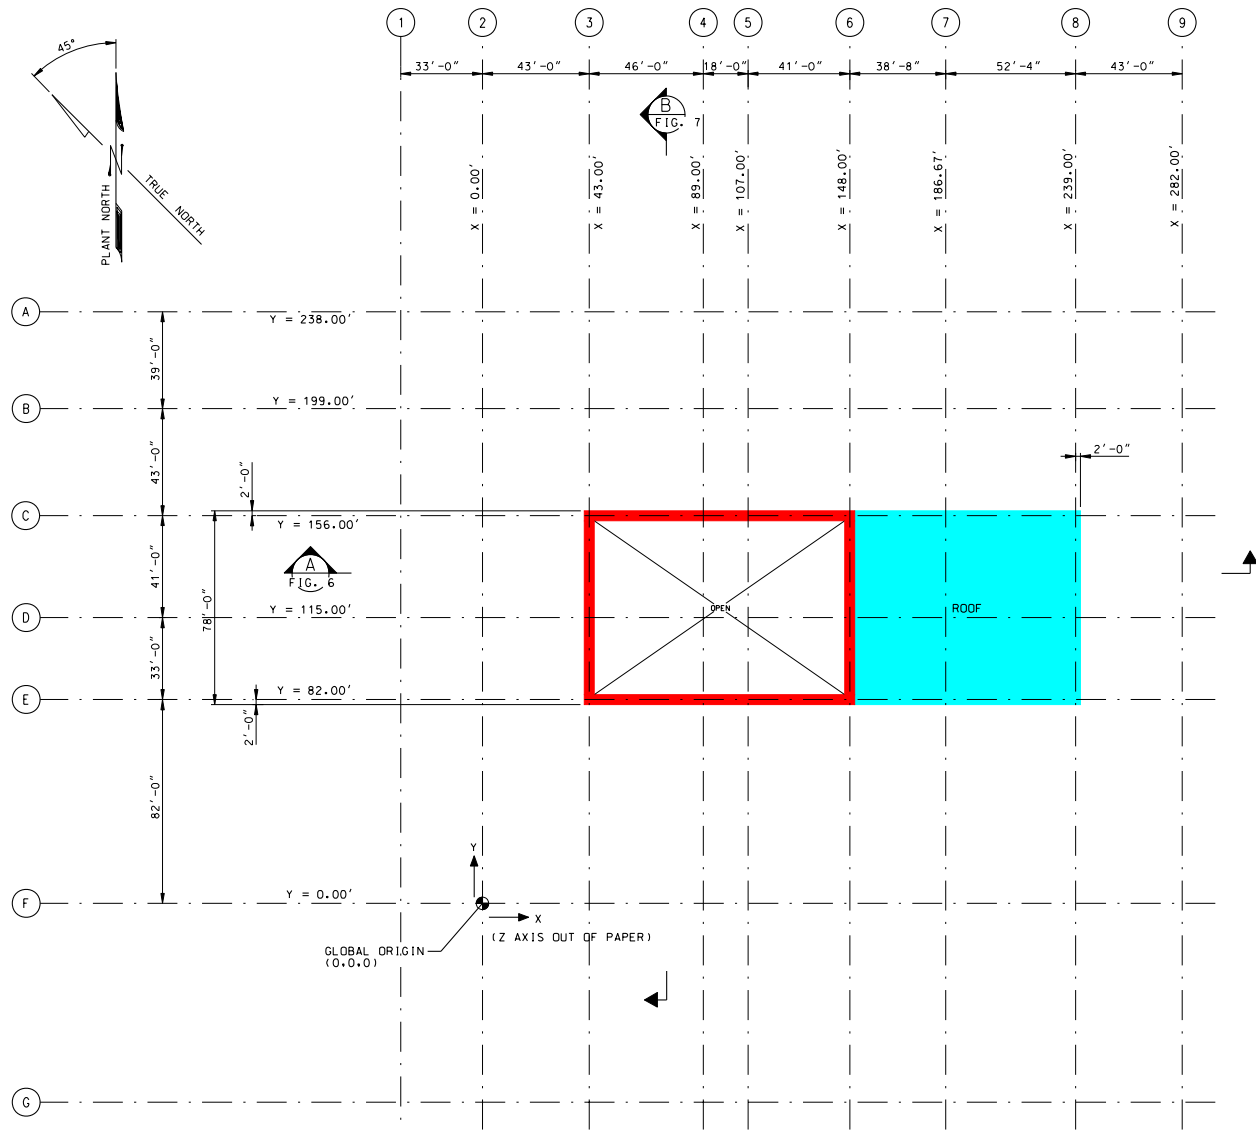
ROOF PLAN AT EL 64'-0" & WALLS FROM EL 64'-0" TO EL 72'-0" & 100'-0"
